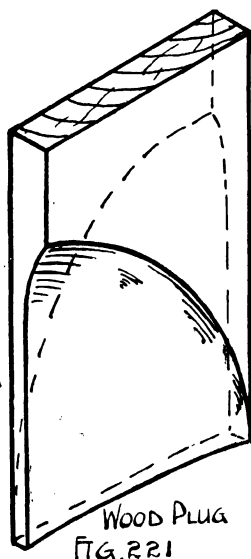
to 220 are elevation, plan, and section of a roof to cover a square bay. The piece A, $3" \times 2"$, may be fixed to the wall by nailing to plugs driven into the joints of the brickwork. The plugs are cut with an axe to have a slight twist, giving a parallel plug (Fig. 221).
